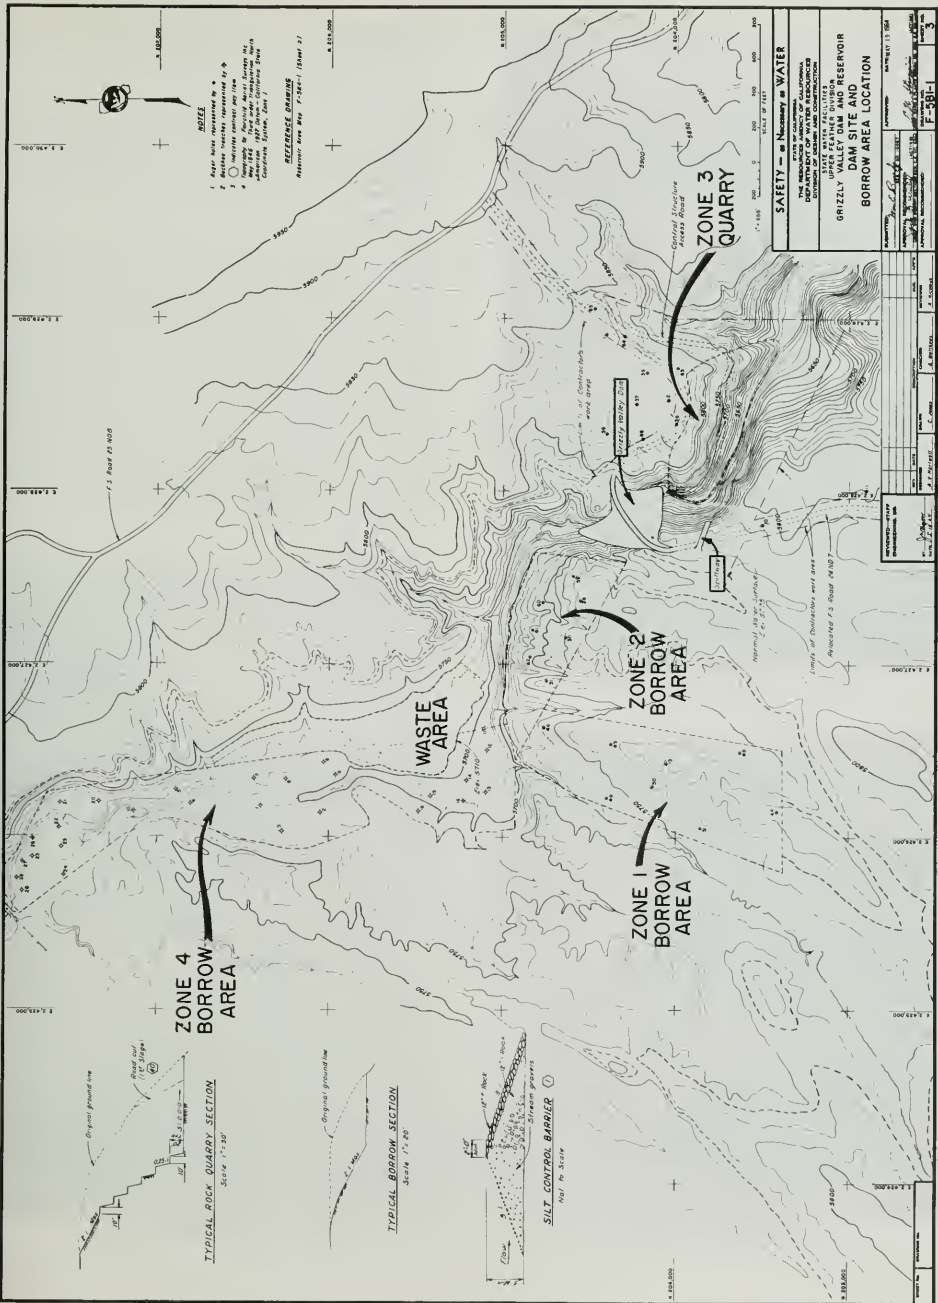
Location of Borrow Areas and Grizzly Valley Dam Site
